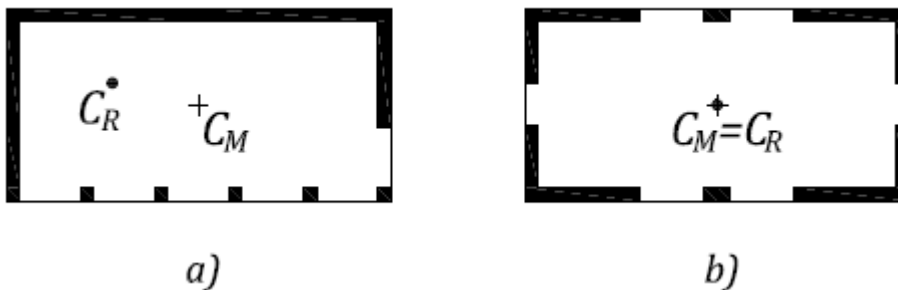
Building plan: a) non-symmetric wall layout (significant torsional effects); b) symmetric wall layout (minor torsional effects).
